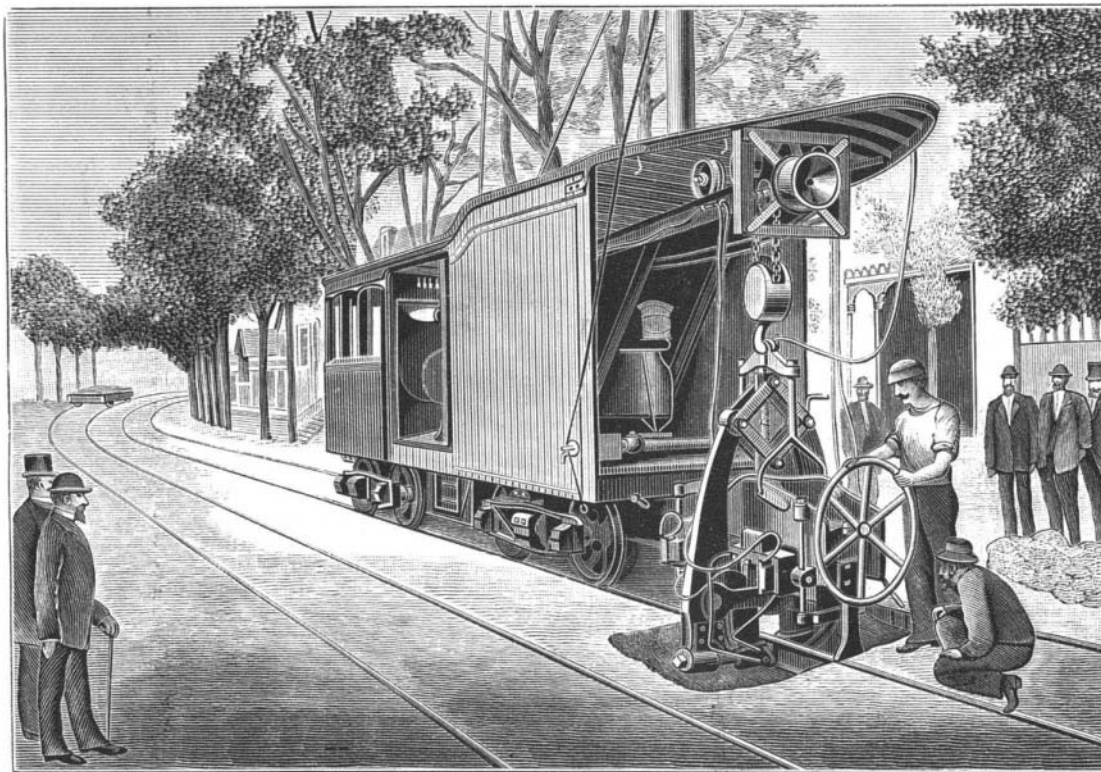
CAR FOR WELDING TRAMWAY RAILS IN PLACE
